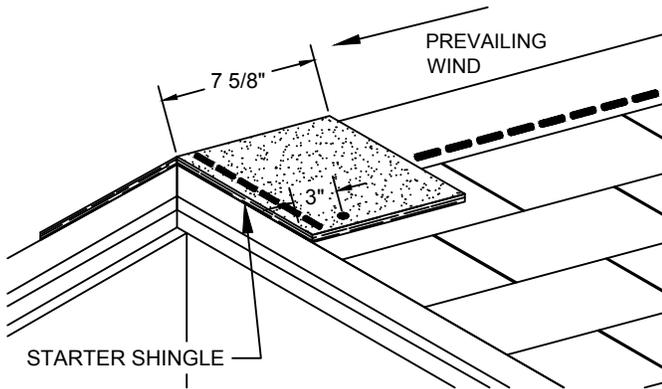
Placement and Fastening of the RidgeFlex® Starter Shingle
